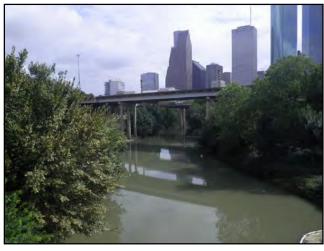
Looking east at I-45 crossing of Buffalo Bayou West 2 from Sabine Street bridge
